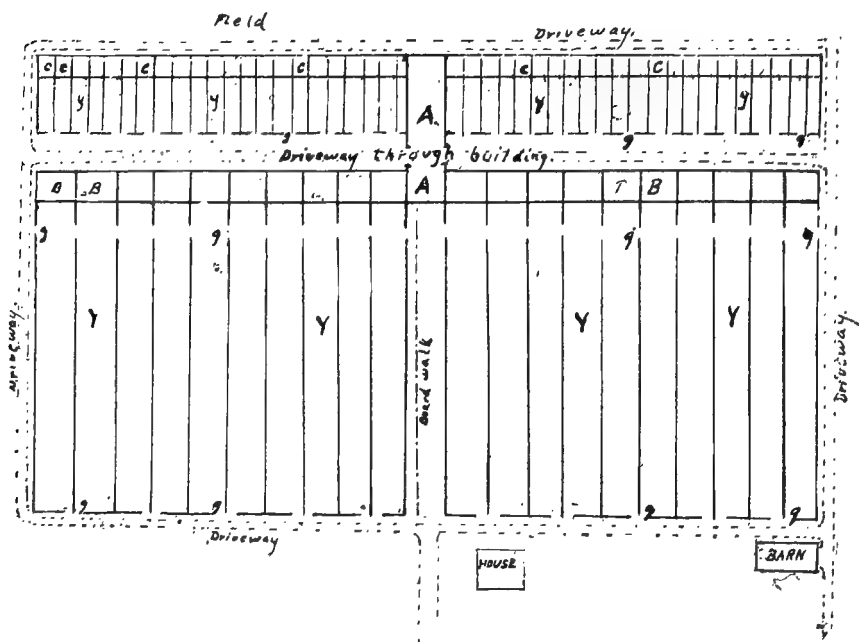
Plat of Plant Arranged so that Work may all be done Under Cover in Stormy Weather.—A, central building; B B, laying houses; C C, brooder or brooder and surplus stock houses; Y y, yards; g g, gates.
